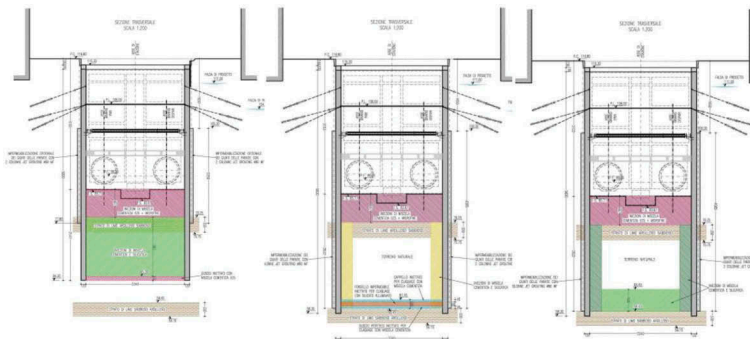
Different injection solutions studied for the waterproofing of the bottom of the excavation.
